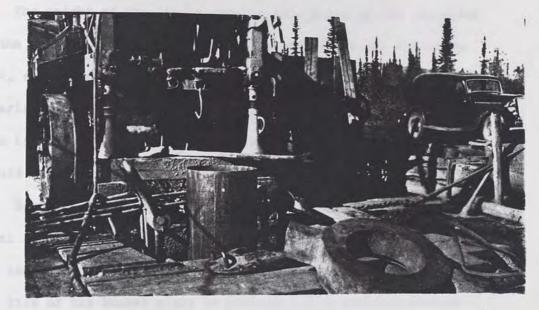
Keystone drill used for sinking an 18 inch hole to bedrock. Depth of hole 240 feet. 18 inch casing pulled into hole with the aid of hydraulic jacks.
